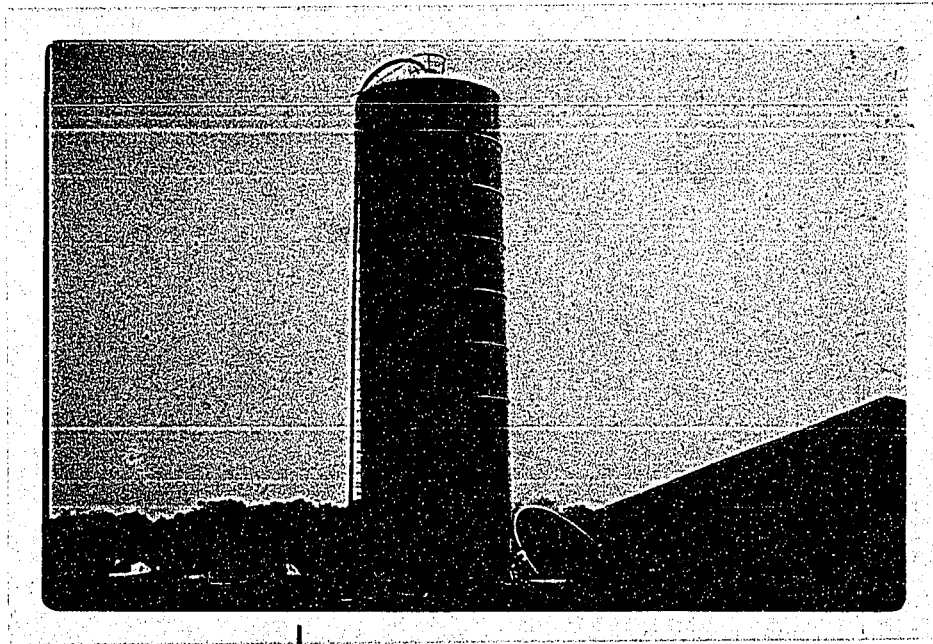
(c) - Tower silo completely erected. Height excluding, the roof = 26.1 m. (85.5 ft.). (Portion of the collapsed concrete silo is seen in the background.)
